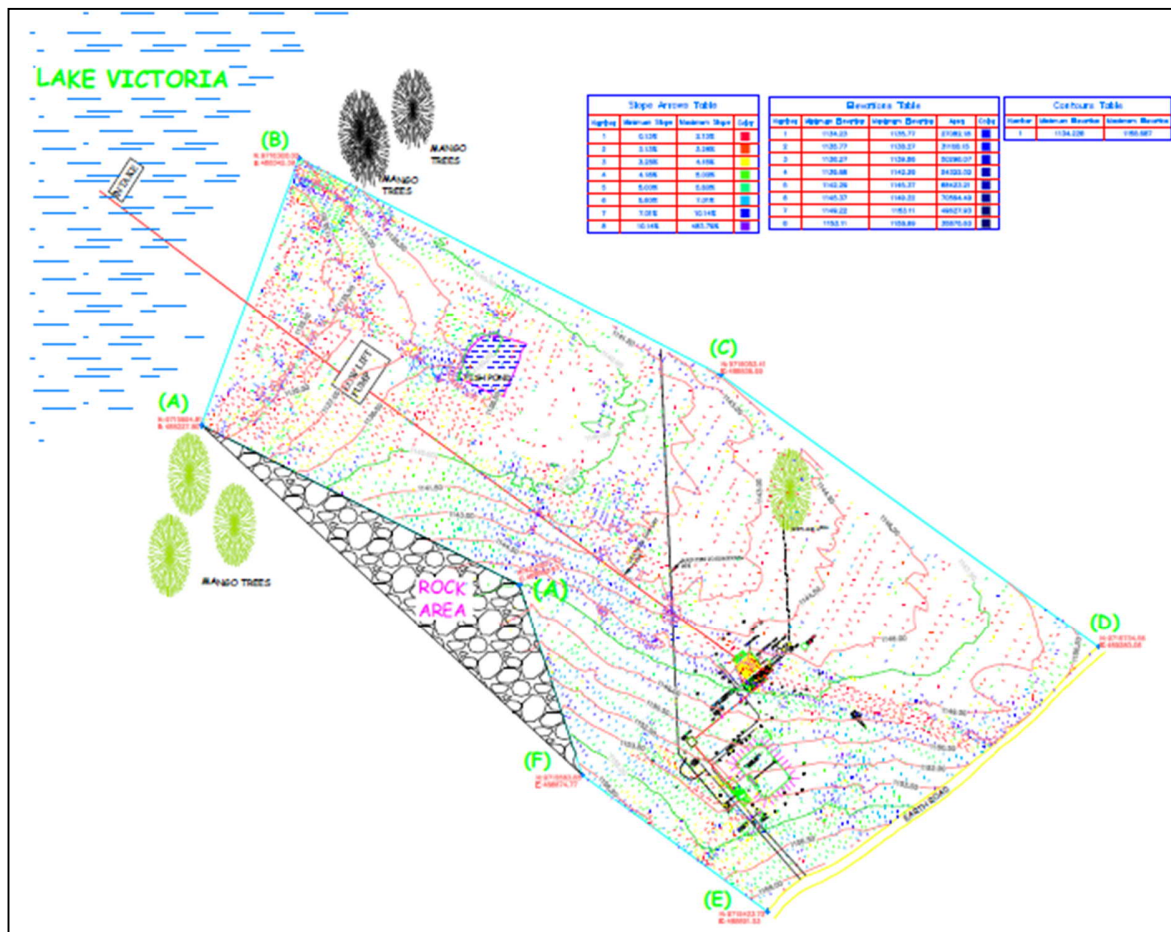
Proposed Layout of Butimba Raw Water Intake and Water Treatment Plant
